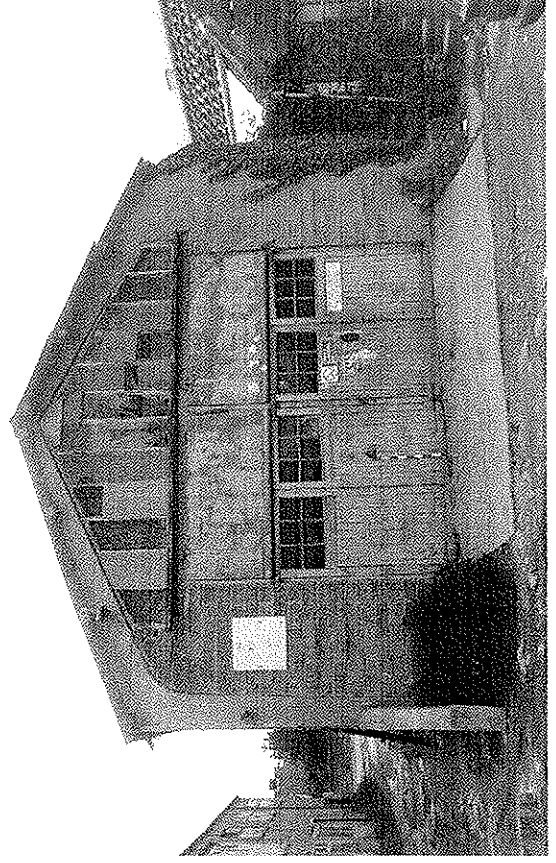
Building F from the south-west showing the truncated roof and cast in-situ concrete north wall.
